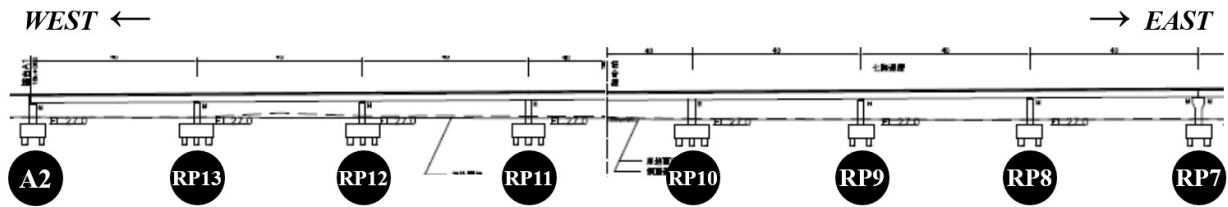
One 7-span double concrete box-girder of Bridge No. 24.
